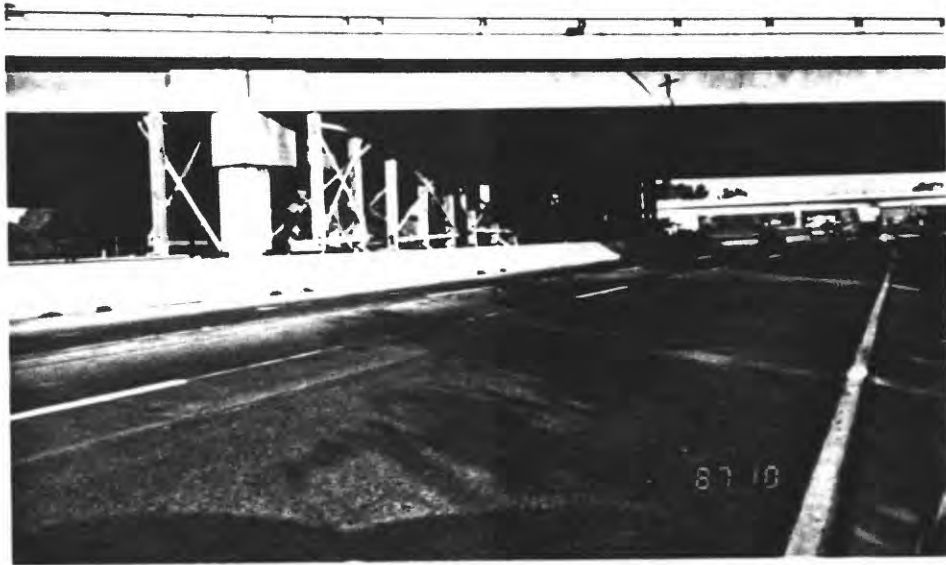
Temporary timber bracing and shoring to provide extra support to the I-605 overpass deck. The I-605/I-5 interchange was opened to traffic 24 hours after the main shock.
